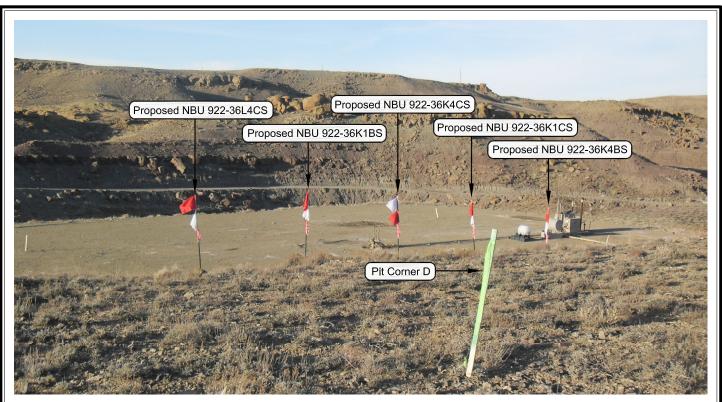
PHOTO VIEW: FROM PIT CORNER D TO LOCATION STAKE
